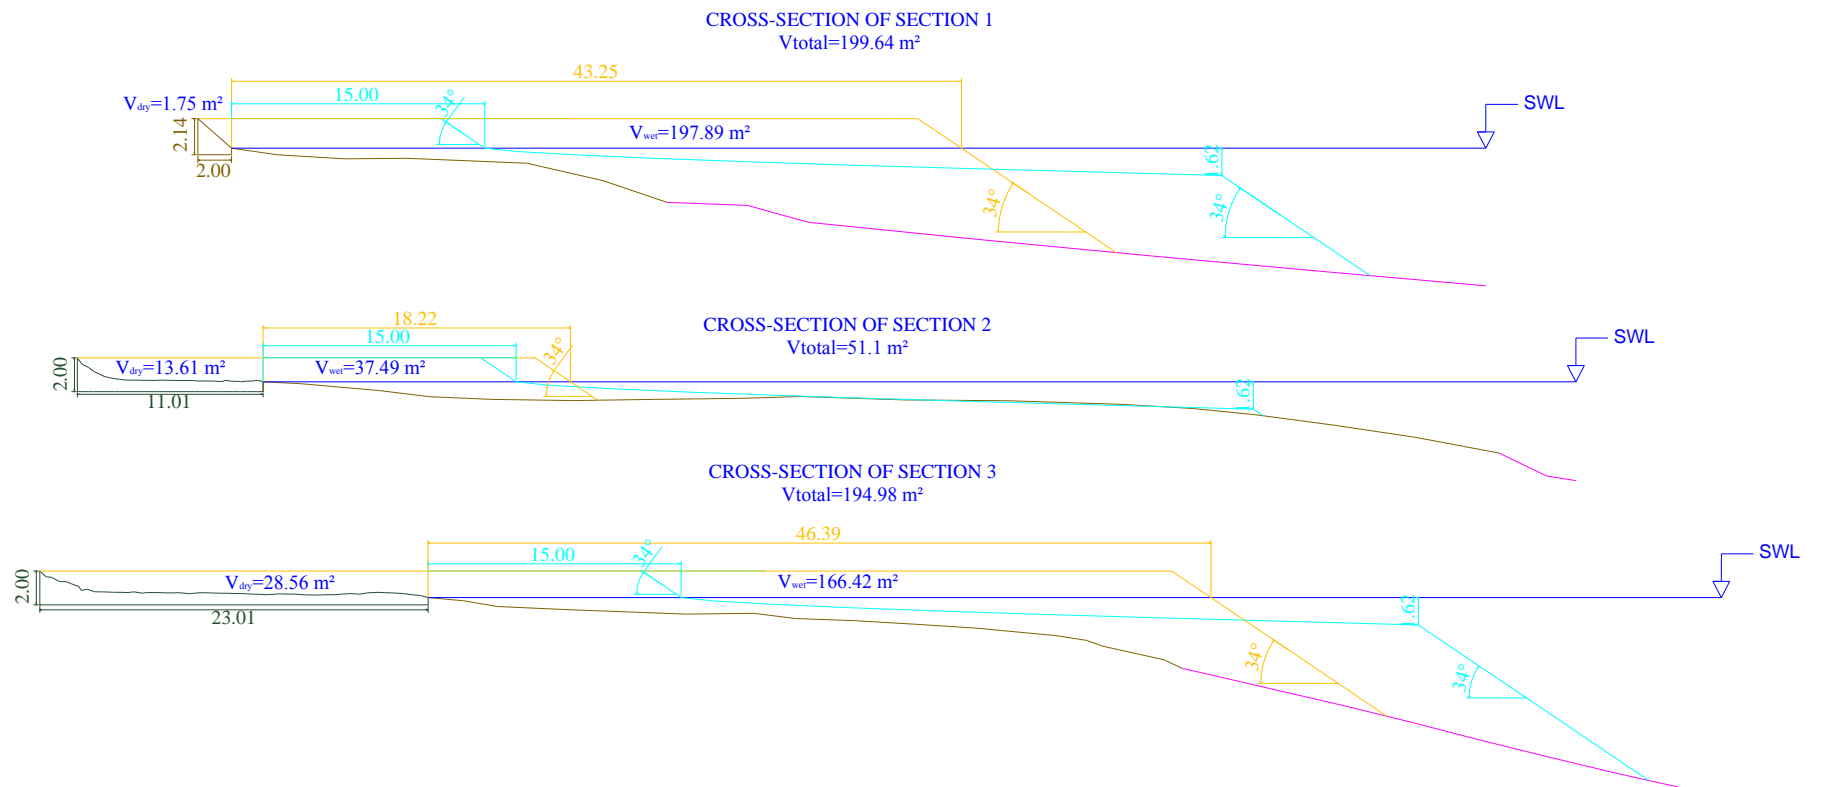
Design profiles of Section 1,2 and 3 for 15 m new dry beach width ($D_{fill}=0.32 \text{ mm}$).
